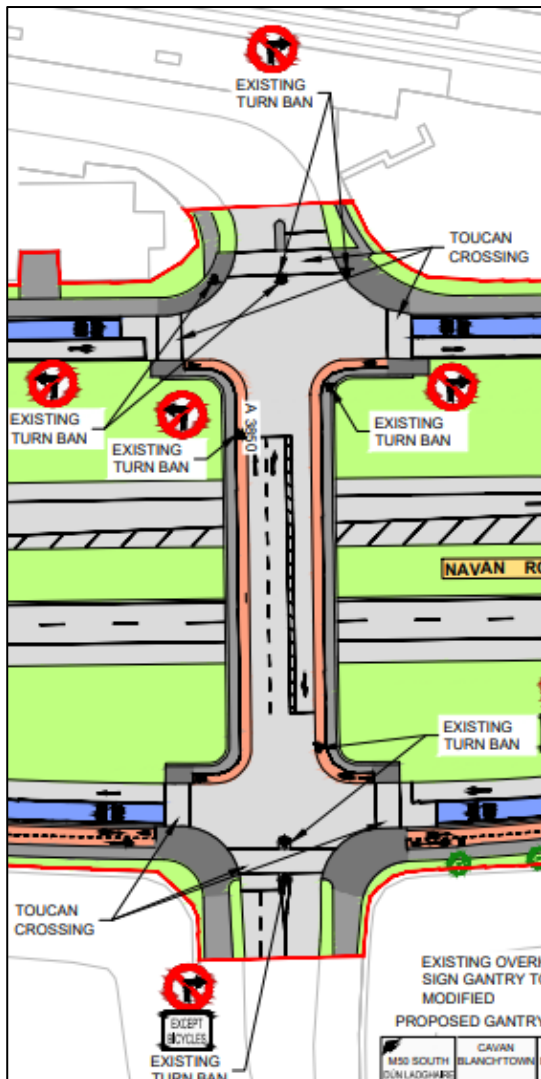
R147 Navan Road / Parkway Bridge Junctions
